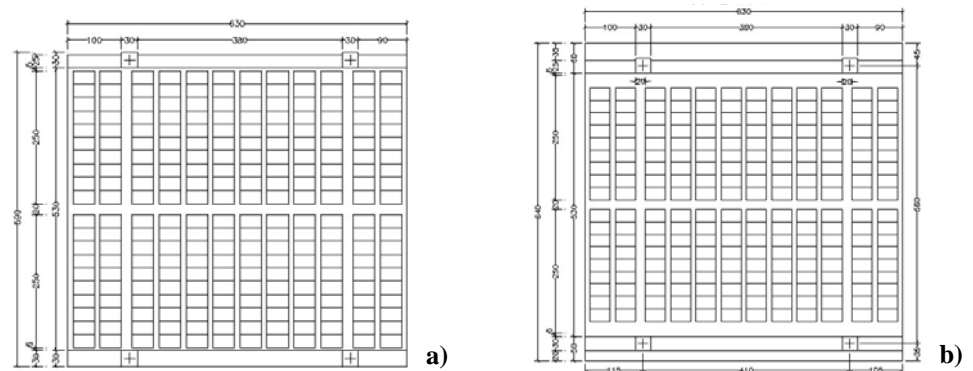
Geometrical characteristics and some structural details of the module n. 5: first level (a) and roof (b) floors, transversal (c) and longitudinal (d) sections, first floor (e) and roof (f) slab cross-section, first level (g) and roof (h) beams and column cross-section (i) (continues)
